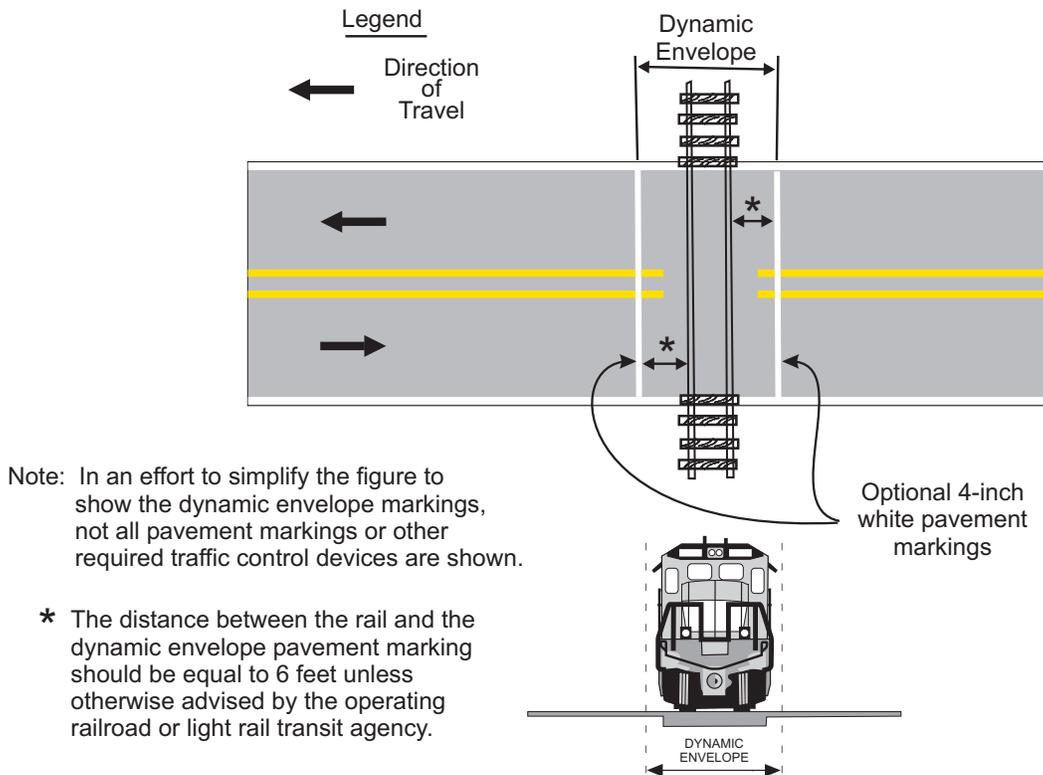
B-8. Example of Dynamic Envelope Pavement Markings at Grade Crossings
